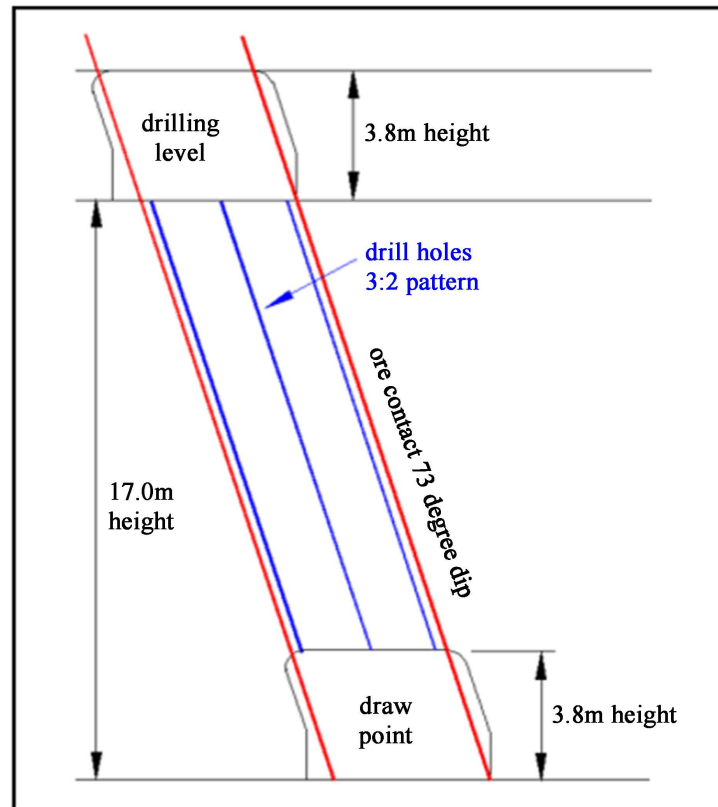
Cross-section—long hole open stope typical sublevel, 4.0 m width [6].
